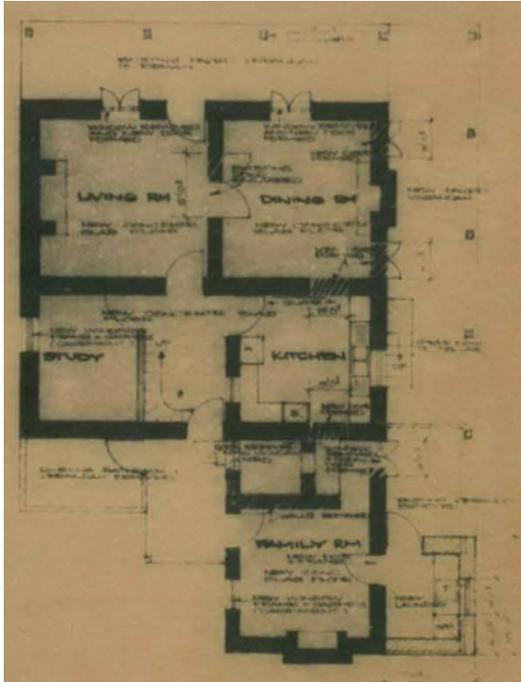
, Ground floor plan, Ian McKay Philip Cox, 08.01.1968
